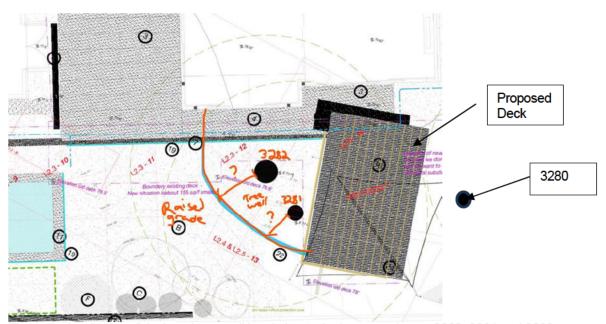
sketch plan of deck and tree well in relation to the house and trees 3280, 3281 and 3282
